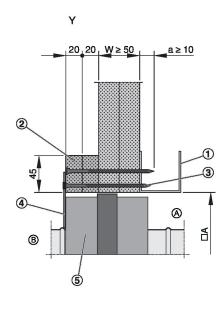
Dry mortarless installation in shaft wall without metal support structure
